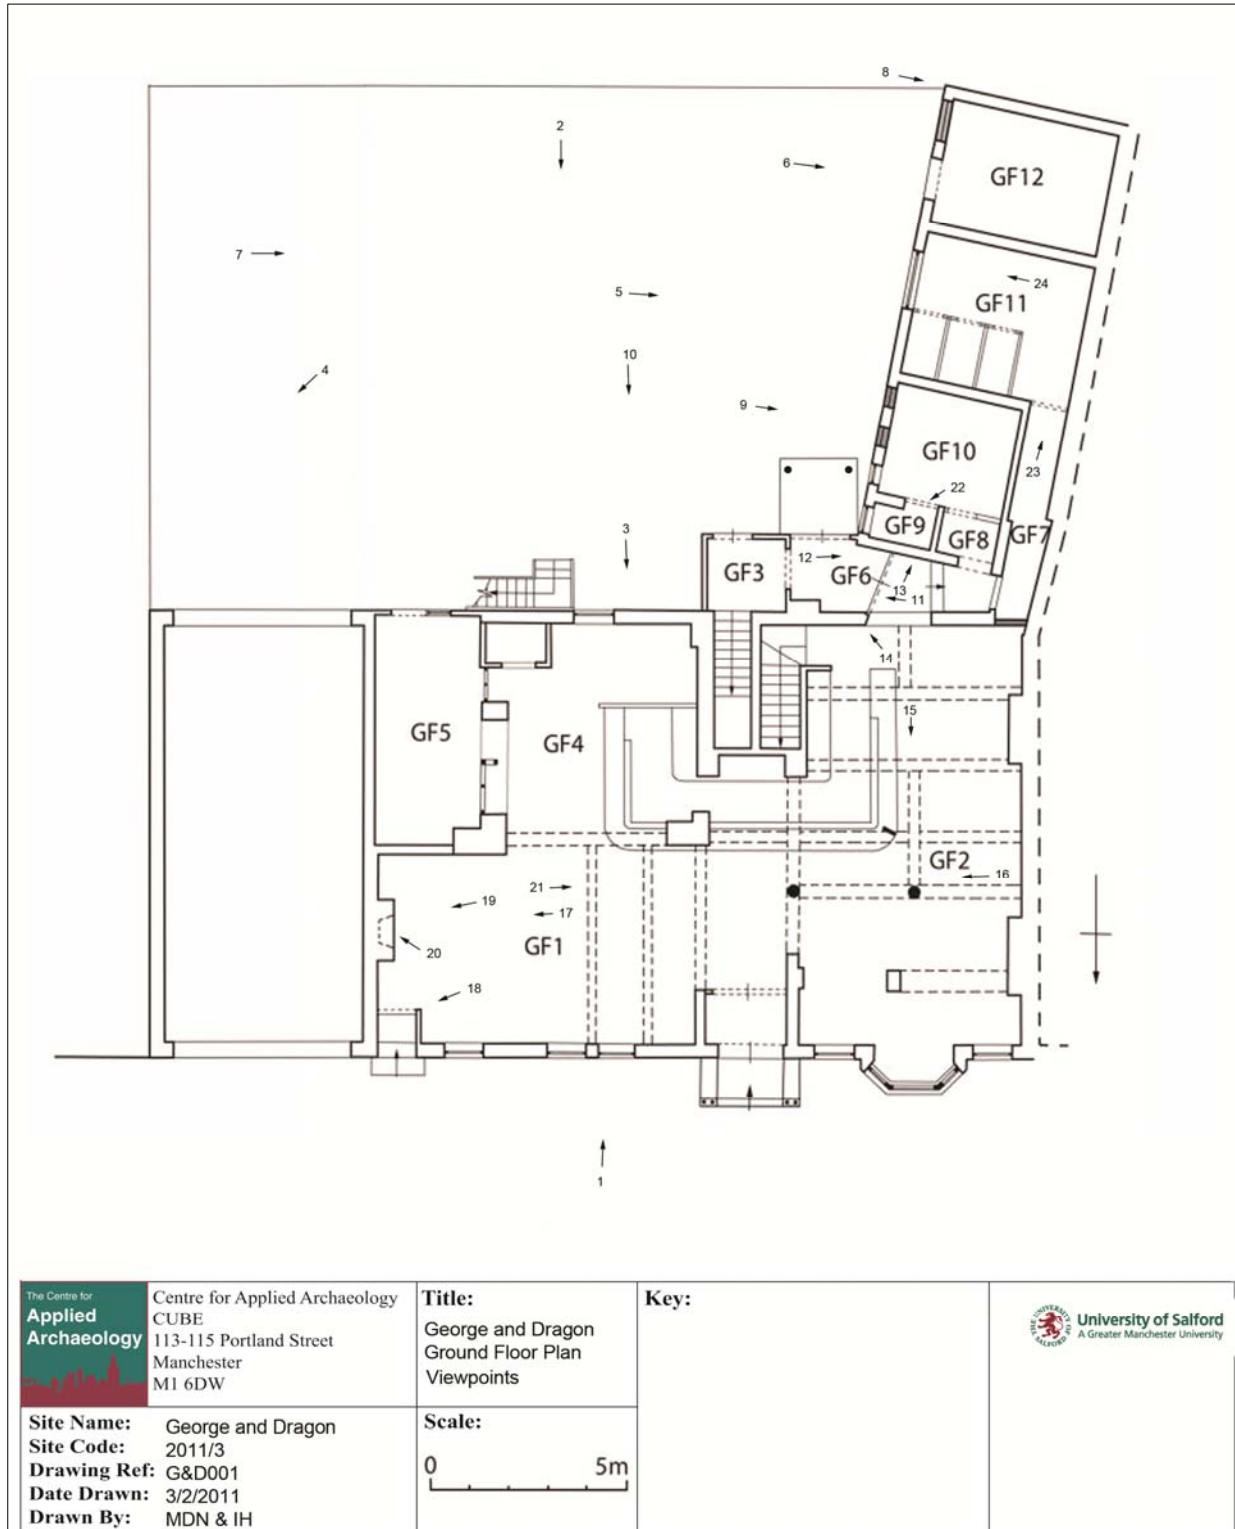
George & Dragon Hotel ground floor plan showing the photographic viewpoints for the current survey and room designations.
